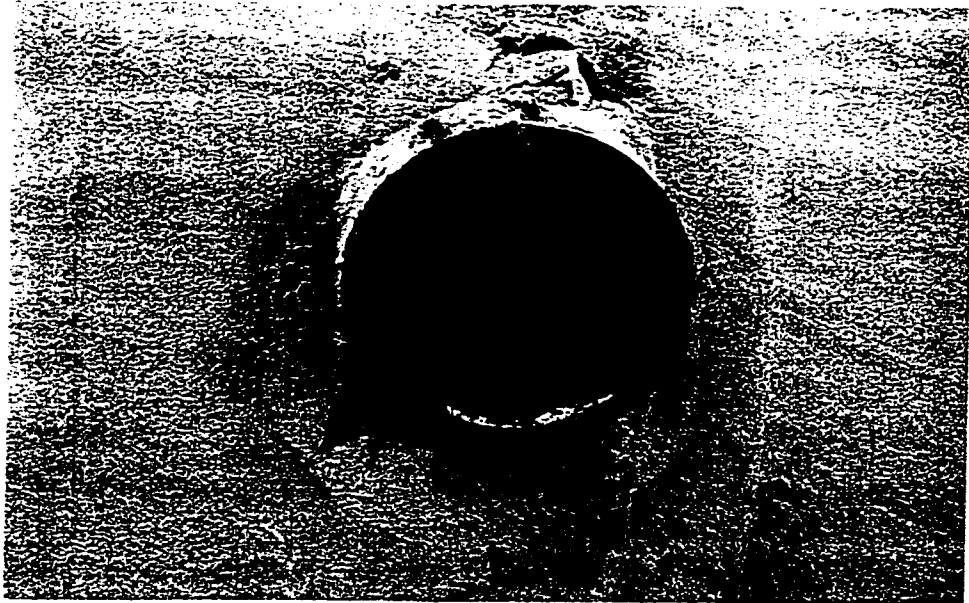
Two Week Excavation of 200mm Pipe in Sand
